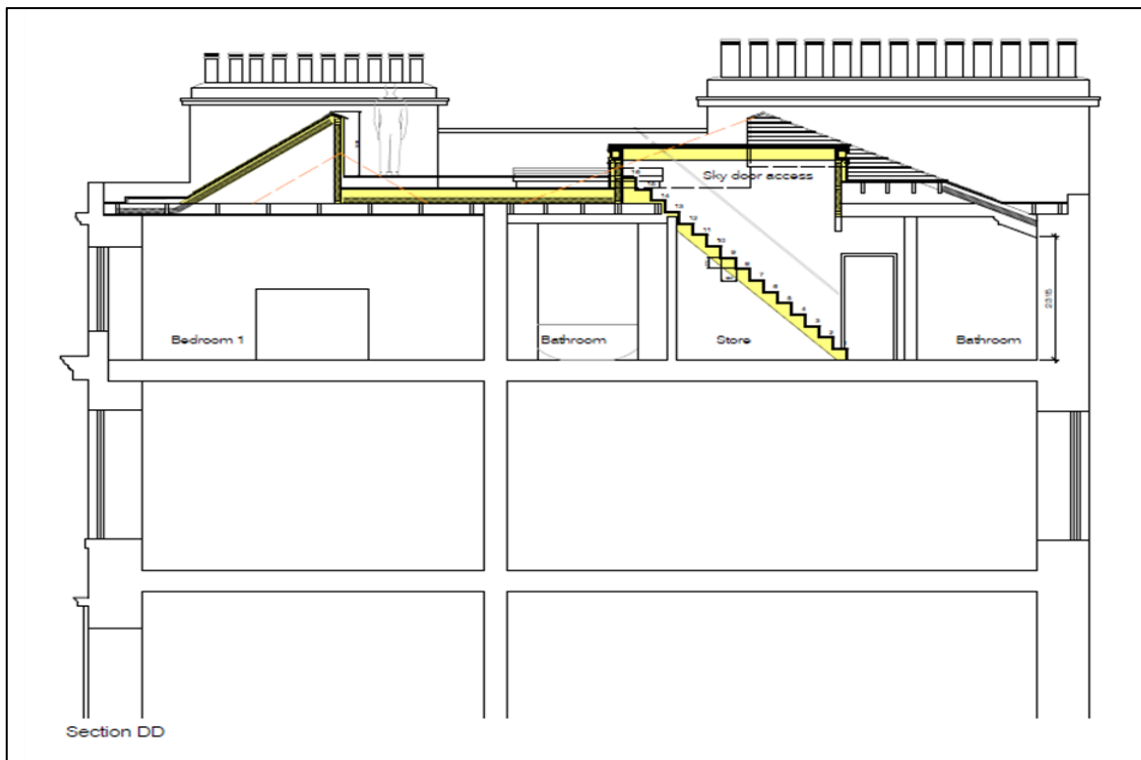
Proposed Sections (Richard Murphy Architects, Drawing No. AL/02/01)
